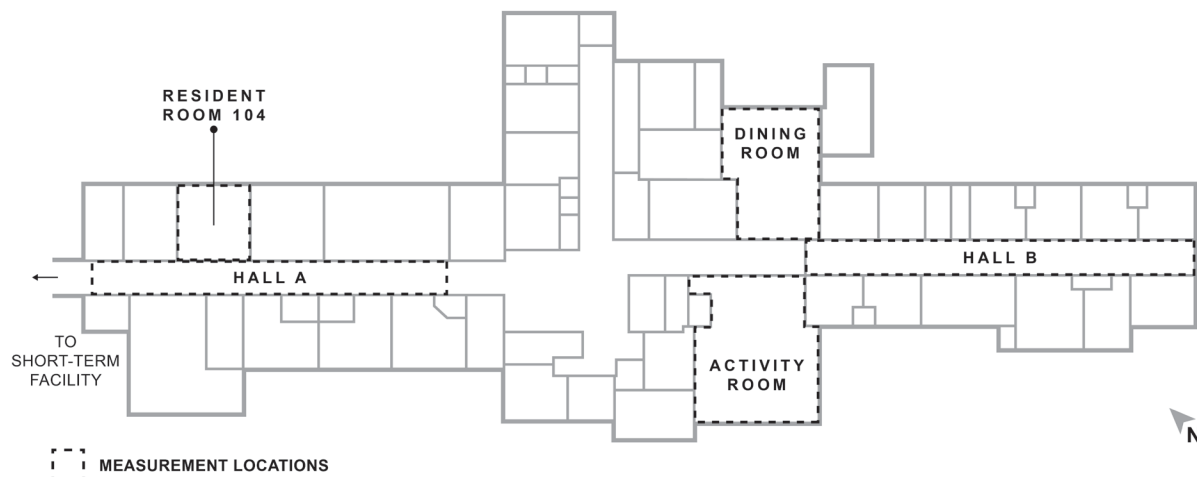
Hope Health and Rehabilitation Center schematic floor plan. Lighting measurements were taken in the rooms shown with a dashed outline. This plan is not to scale.
